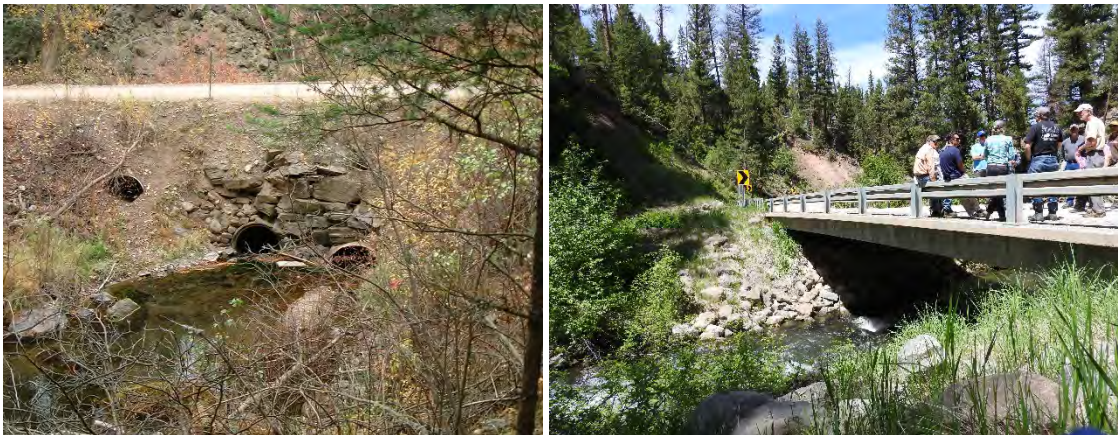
POORMAN CREEK CULVERT (2002; L) TO BRIDGE (2018; R).
